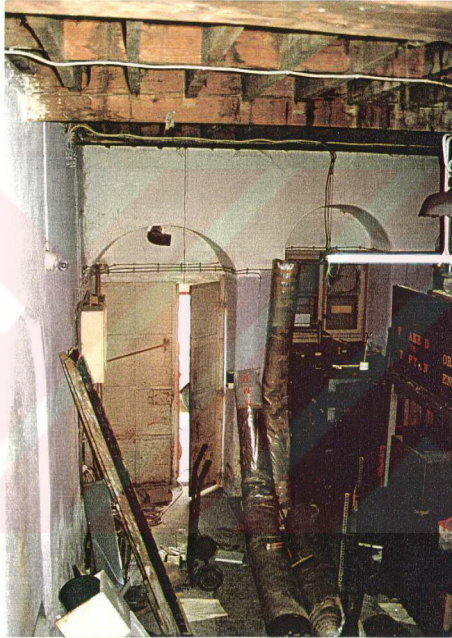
Arches over the door and windows of Space 14 (Ground Floor)
